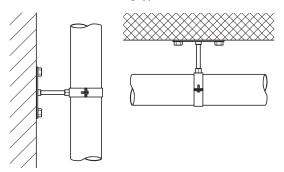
Vertical and horizontal fastening of sliding points with a pipe bracket on the pipe
